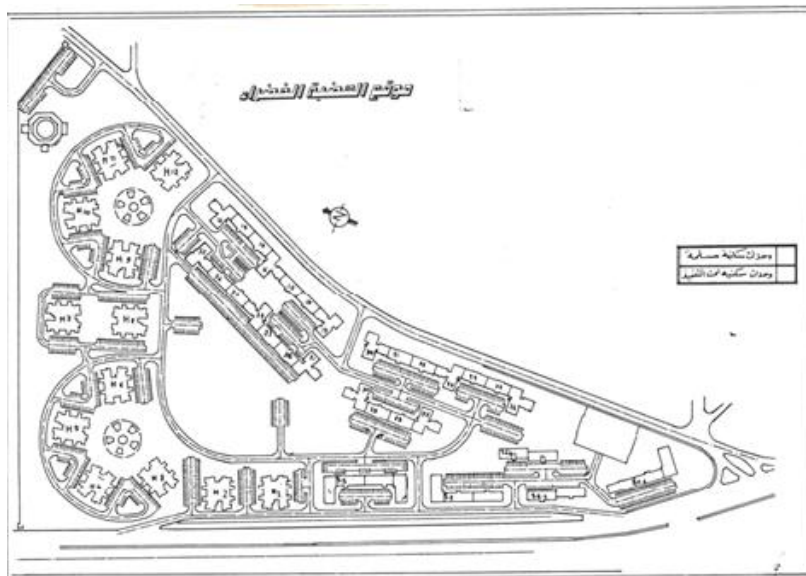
Layout Site Plan Al - Hadba Khdra Housing Project
